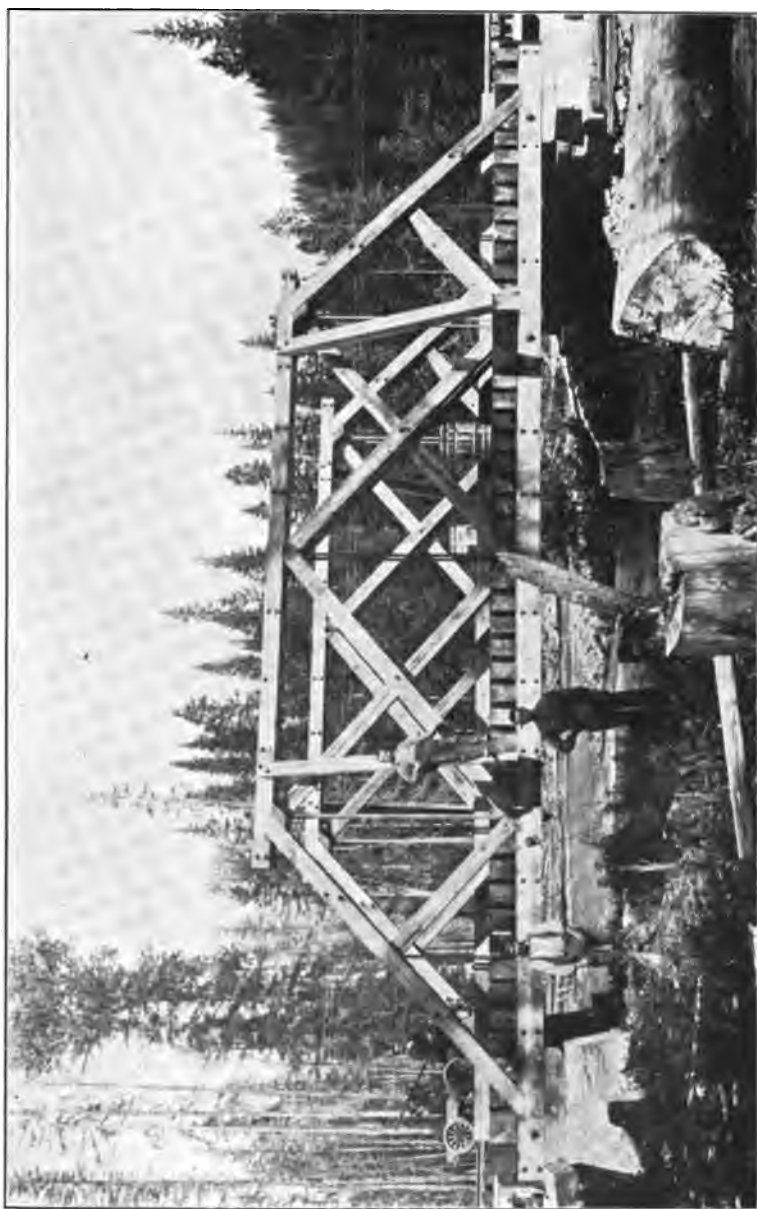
Pony Howe Truss Bridge on Crow's Nest Line, Canadian Pacific Railway, 1901. Span 50 feet.
